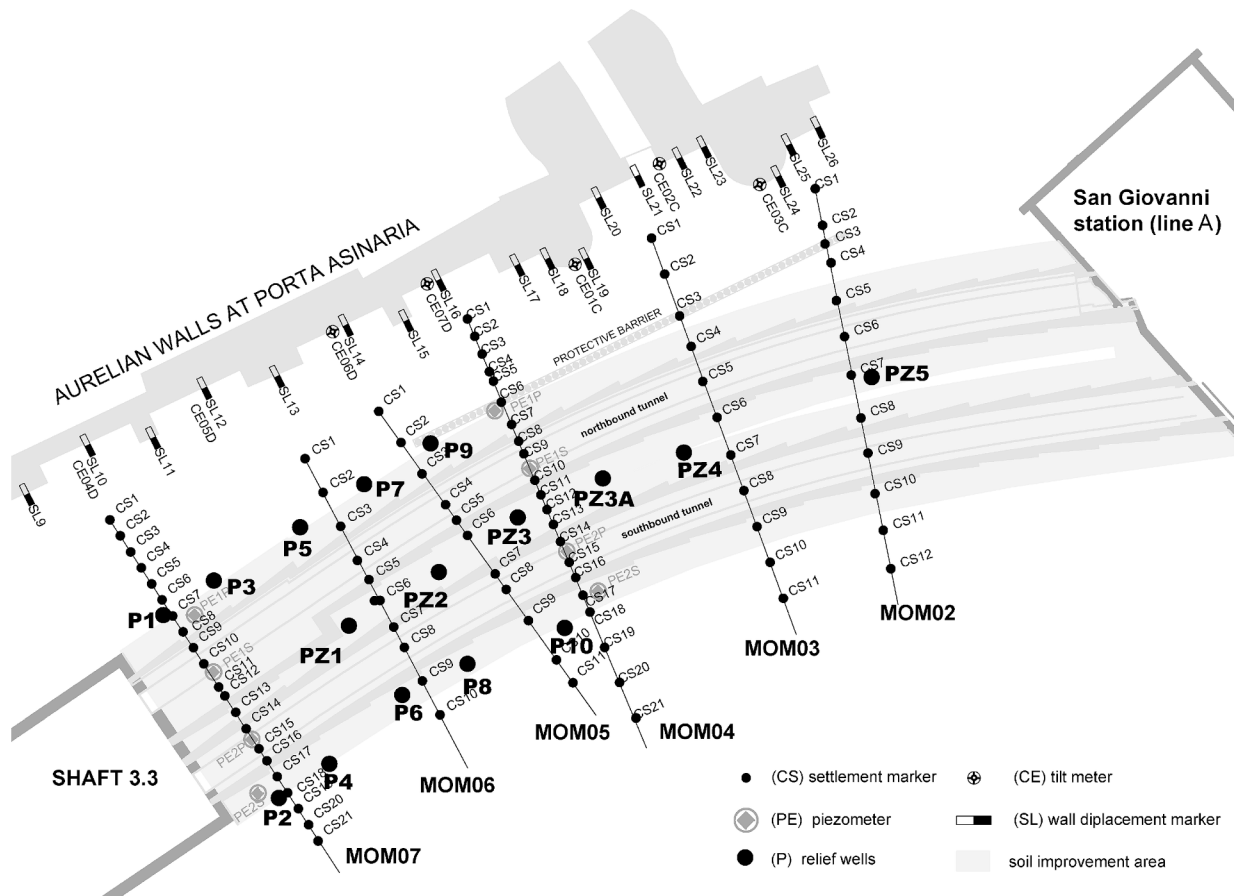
Plan view of the monitoring system in the stretch between the TBM launching pit and San Giovanni Station.
